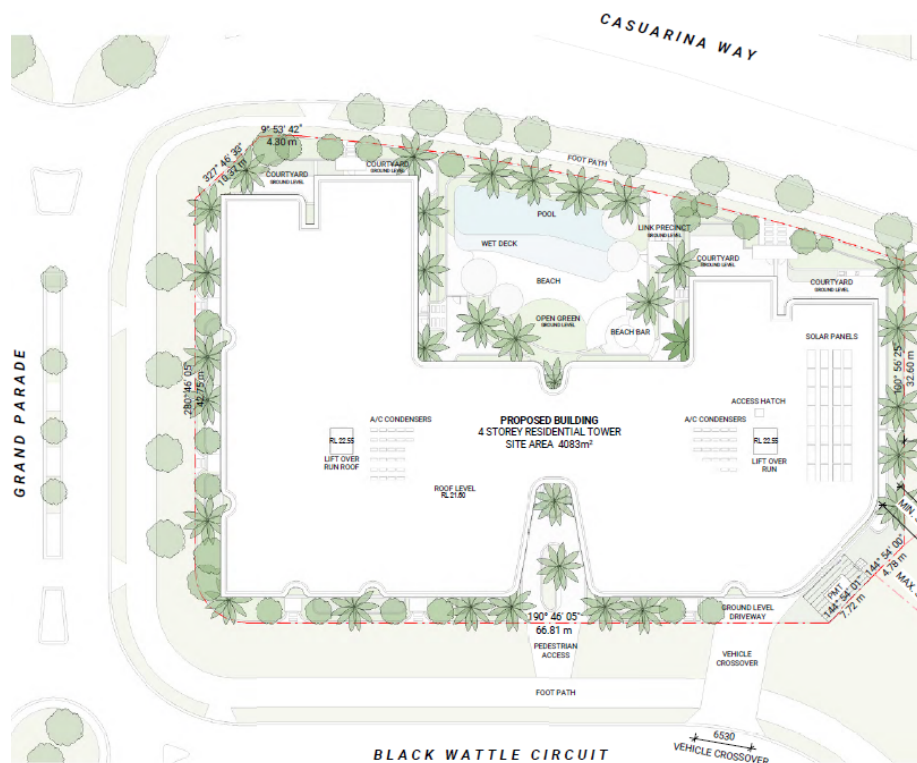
Proposed site plan (source: Drawing No. DA030 - DA Plans by plus architecture June 2021)
